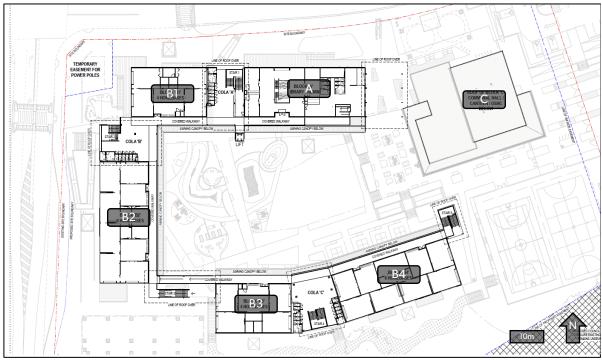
| Proposed first floor layout (Base source: Applicant's SRtS2 2020)
